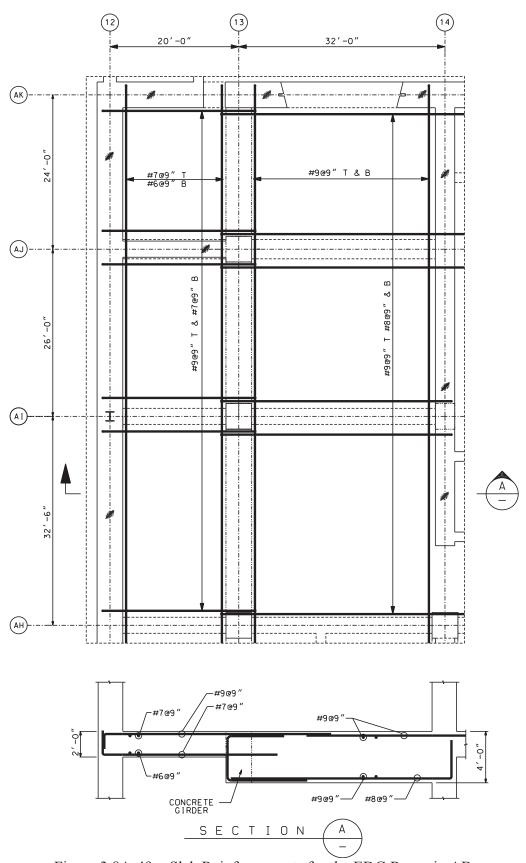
A-49 Slab Reinforcements for the EDG Room in AB
